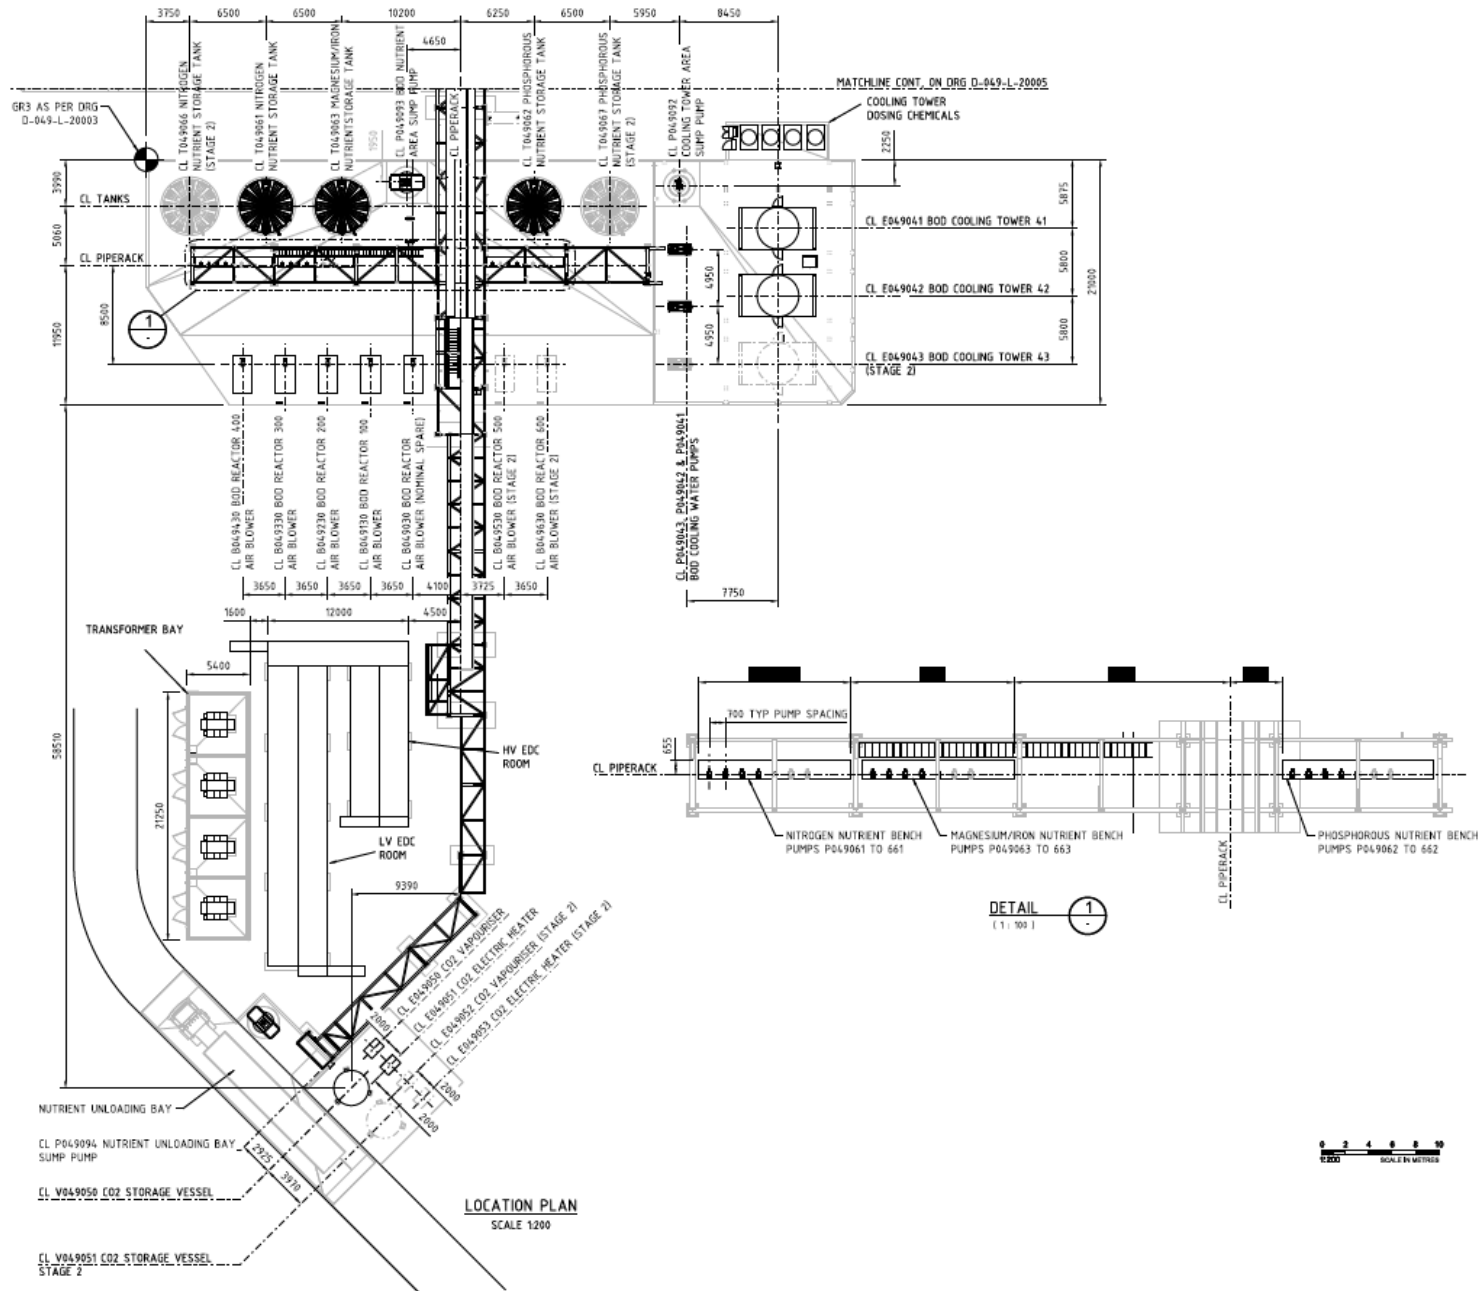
Cooling Towers, Blowers & Nutrient Area Equipment Location Plan
